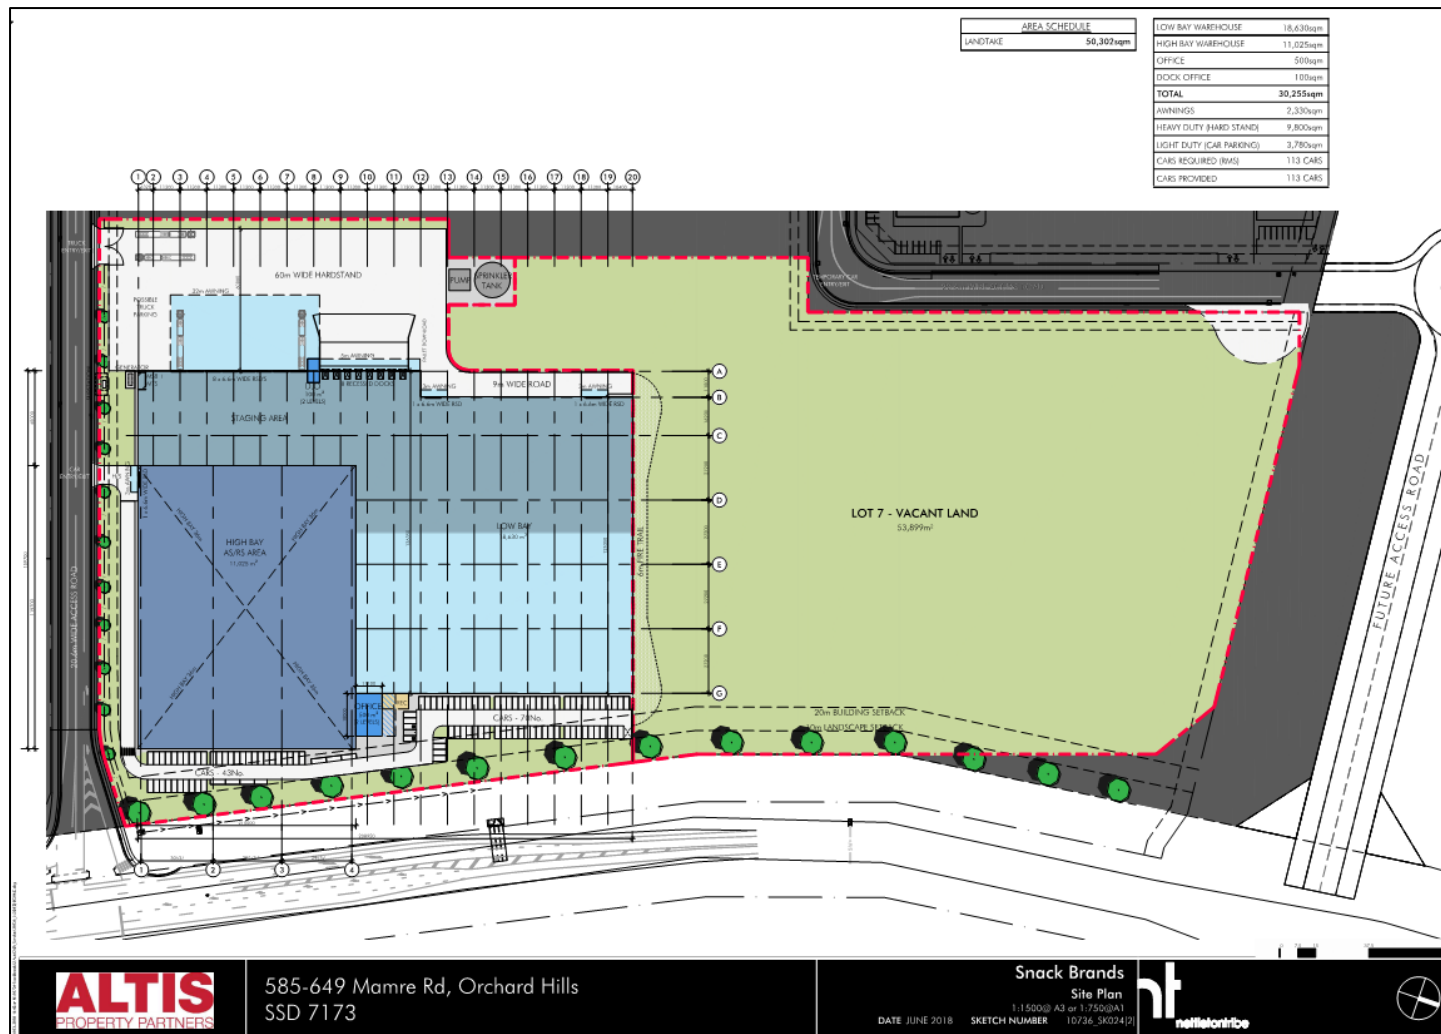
Proposed Development Site Plan (Nettleton Tribe, 2018)
